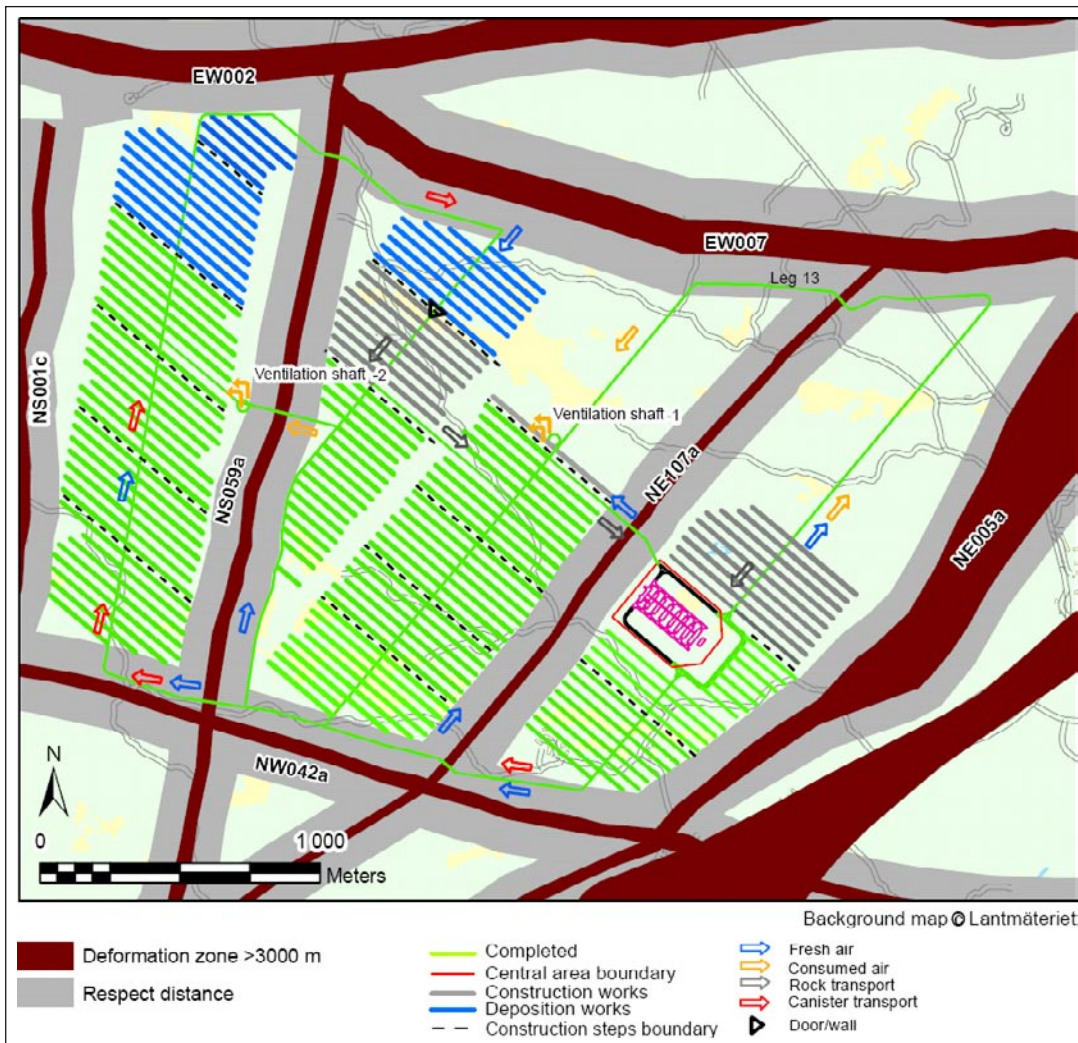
Excavation in construction steps 14 and 15 and deposition works in construction steps 12 and 13.
